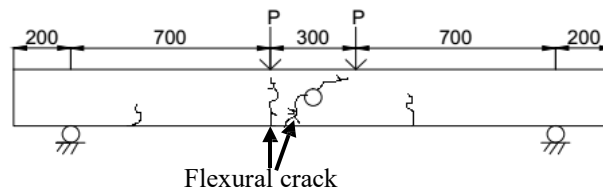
Crack pattern of beam B3 (unit in mm).
